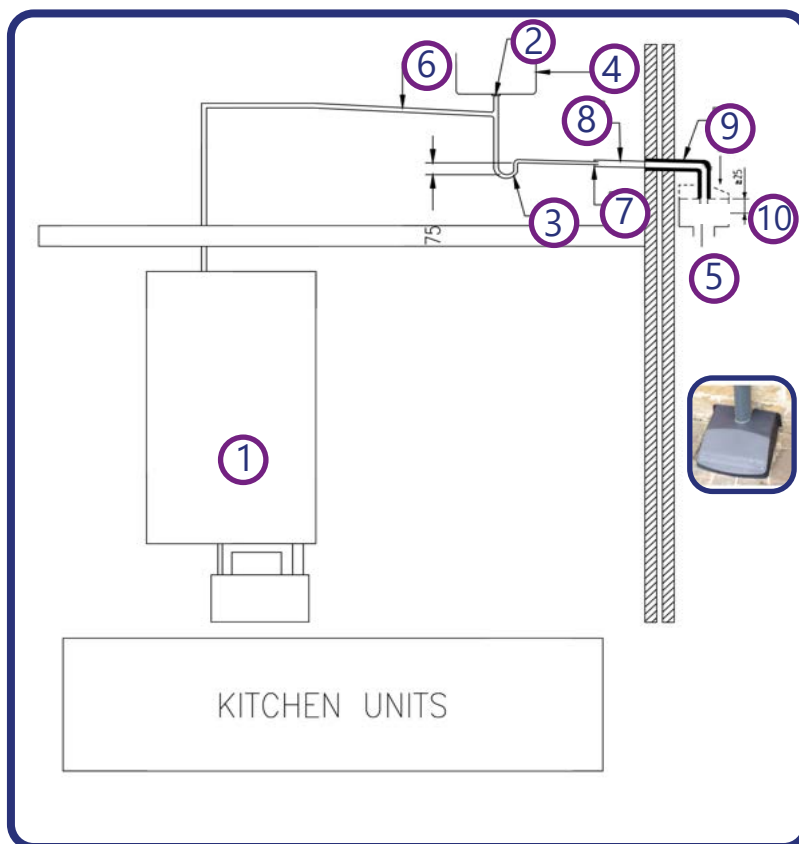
Connection of a condensate pump - typical method (NB manufacturer's detailed instructions should be followed).
